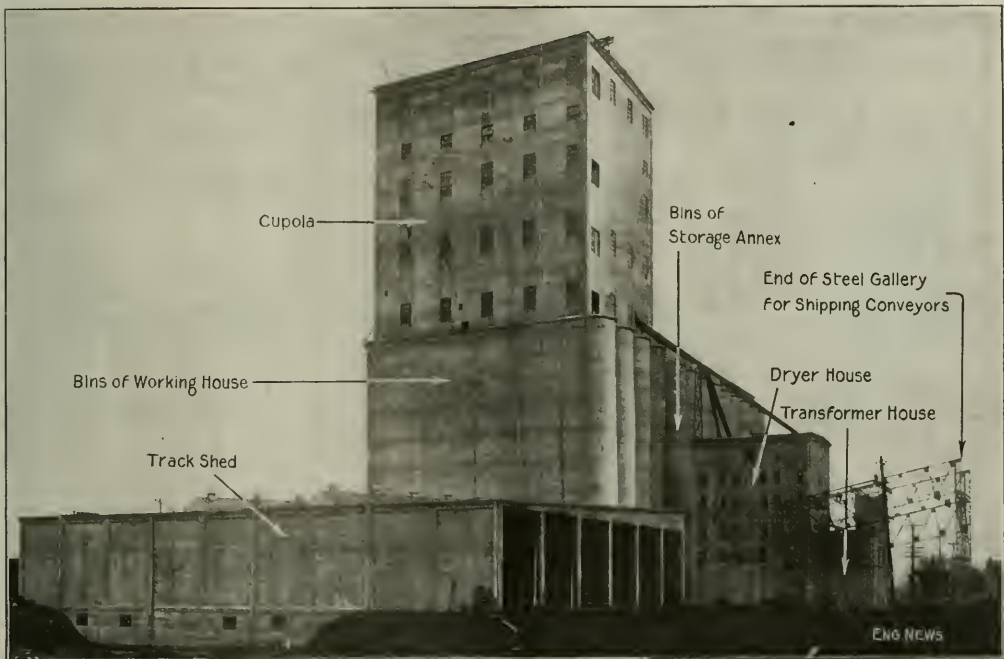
COMPLETED BUILDINGS OF THE GIRARD POINT GRAIN ELEVATOR
